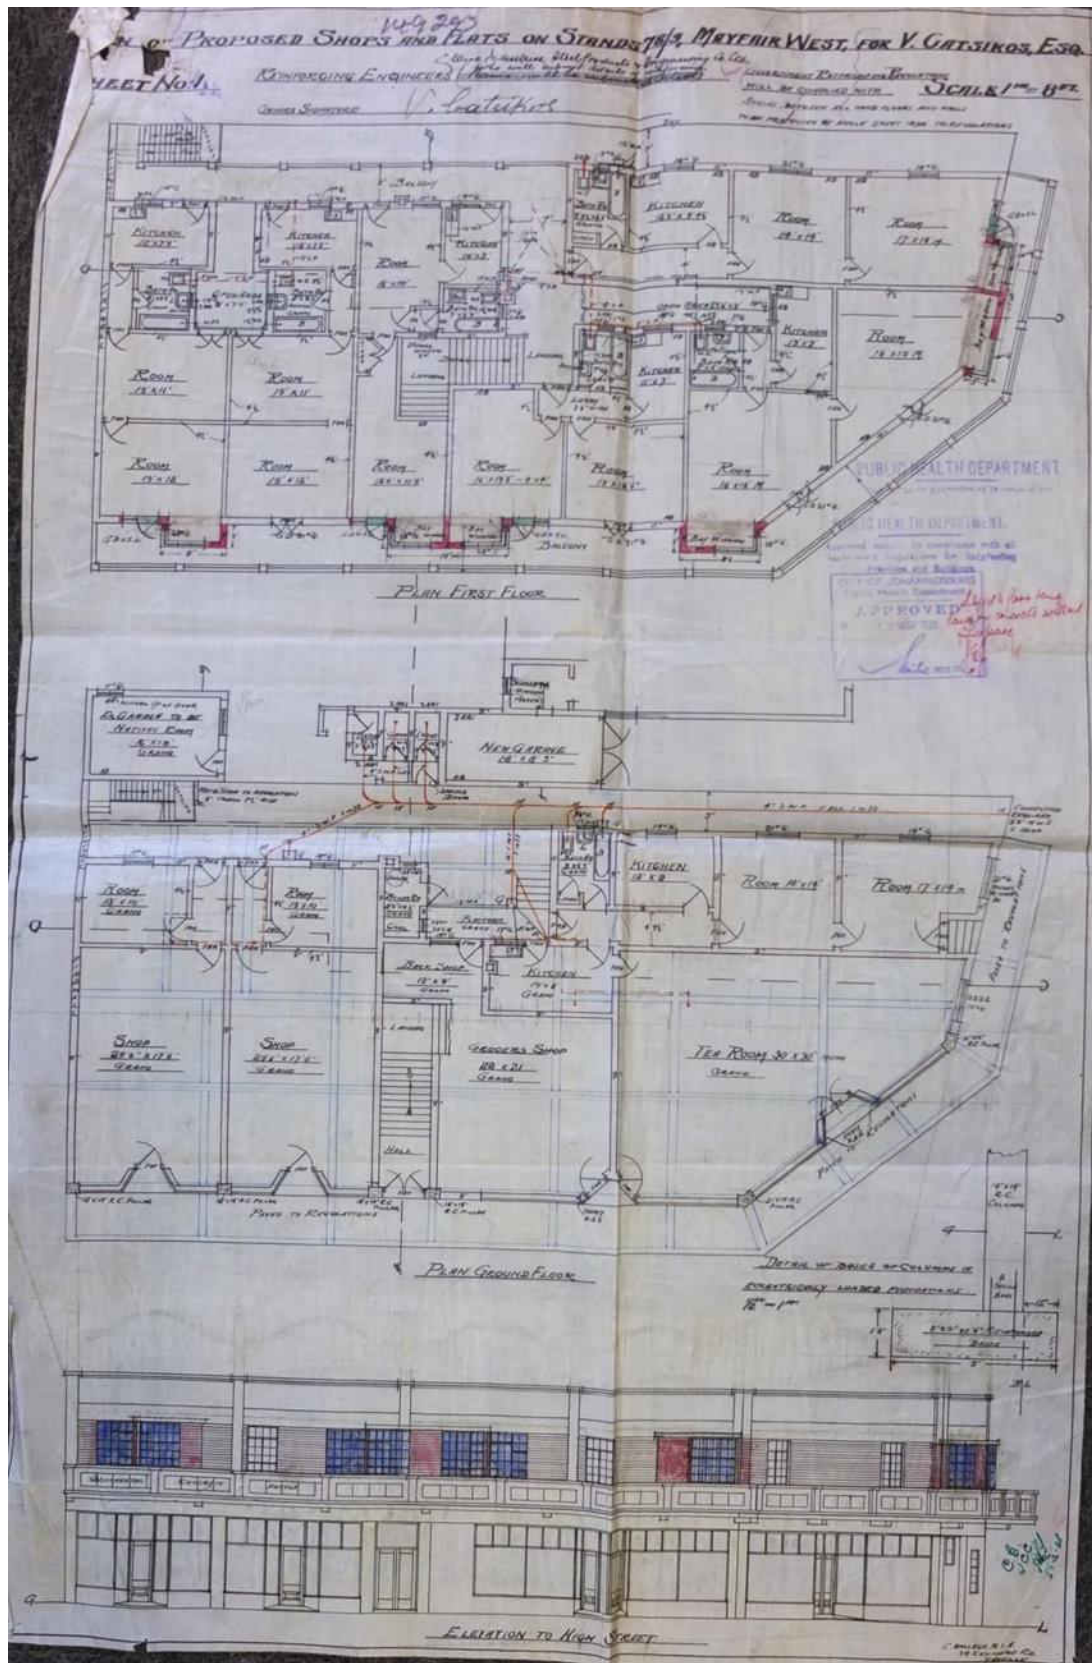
Proposed plan for shops and flats, plan shows floor plan and street elevation (Source: City Council of Johannesburg, Plans Archive)
